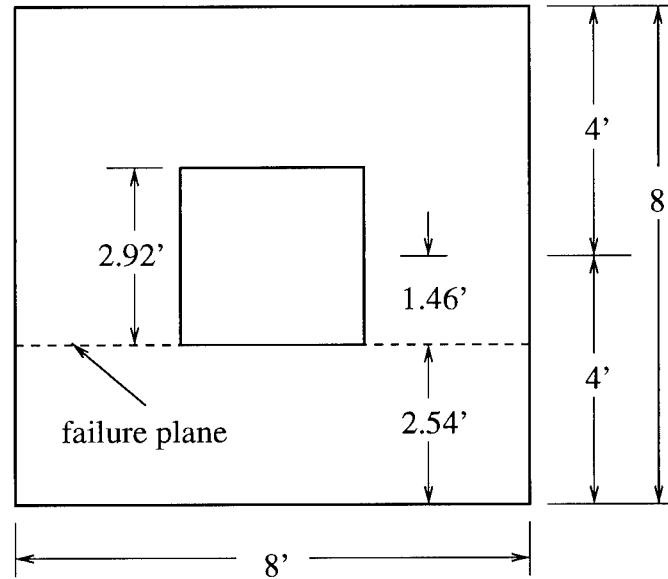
Moment Failure on Column Footing: Critical Plane at the Support Face
